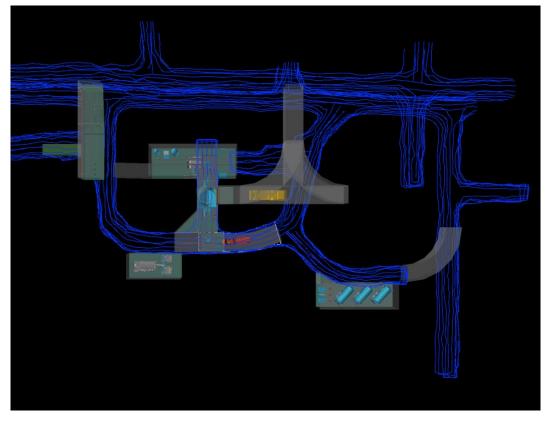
Paste Plant Infrastructure Top View (with access drifts shown)
